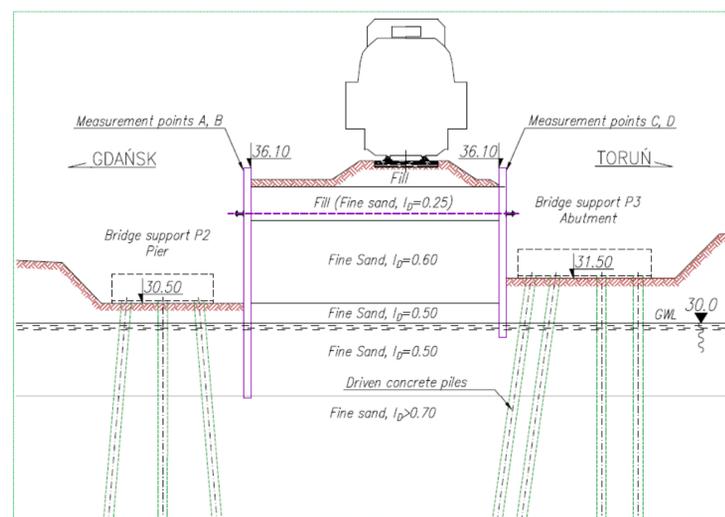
Embankment retained by sheet-pile walls (cross section after piling completion)
